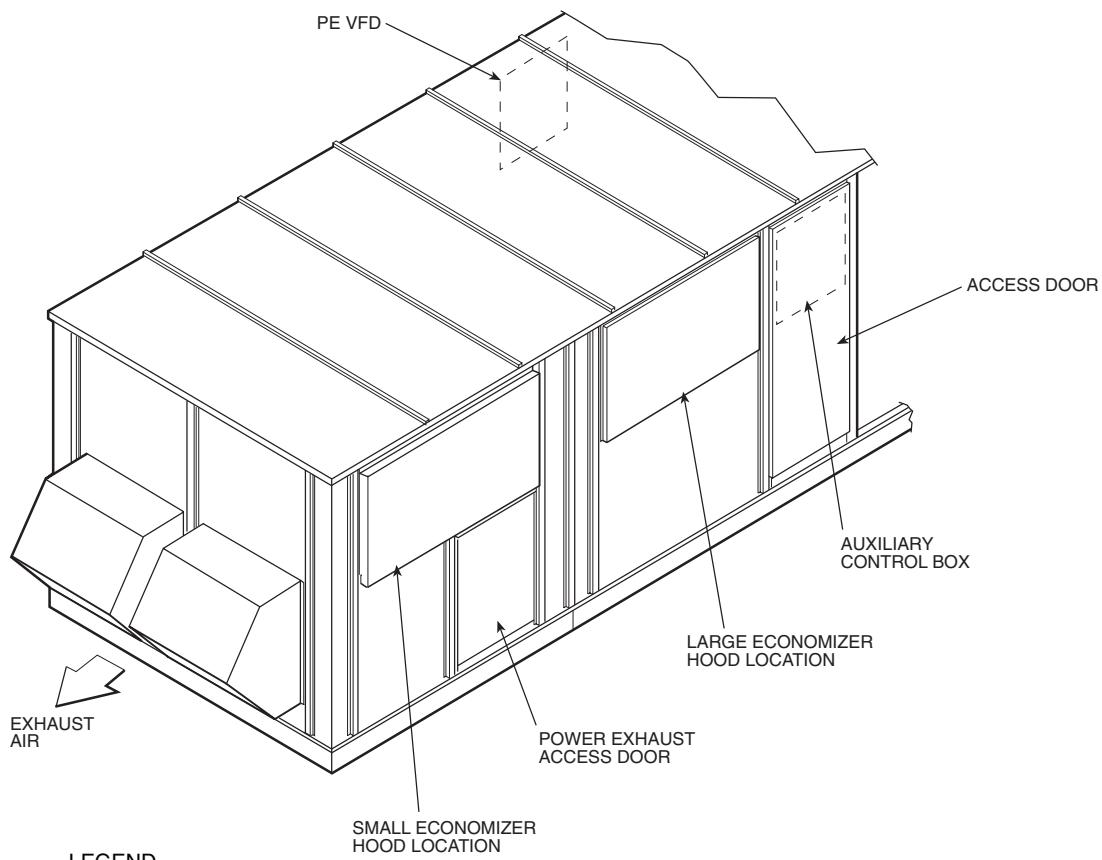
Economizer Hood Location — 48ZT,ZW Units
